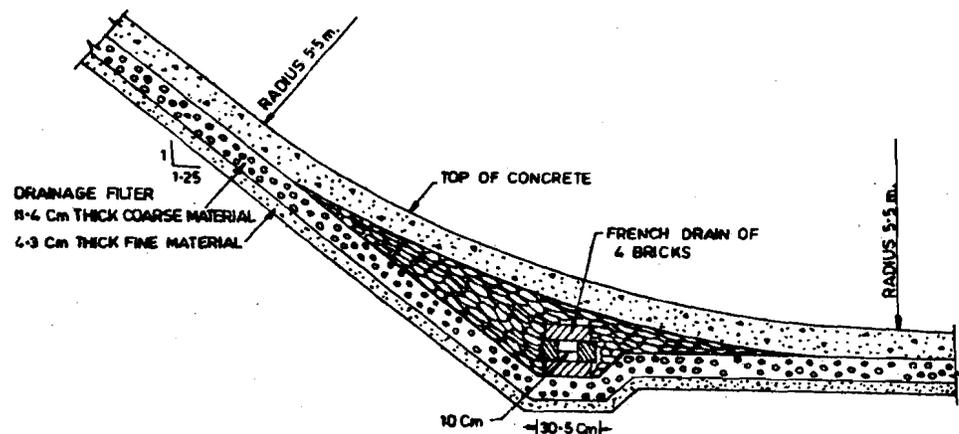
A Typical Drainage Arrangement behind a Lining
